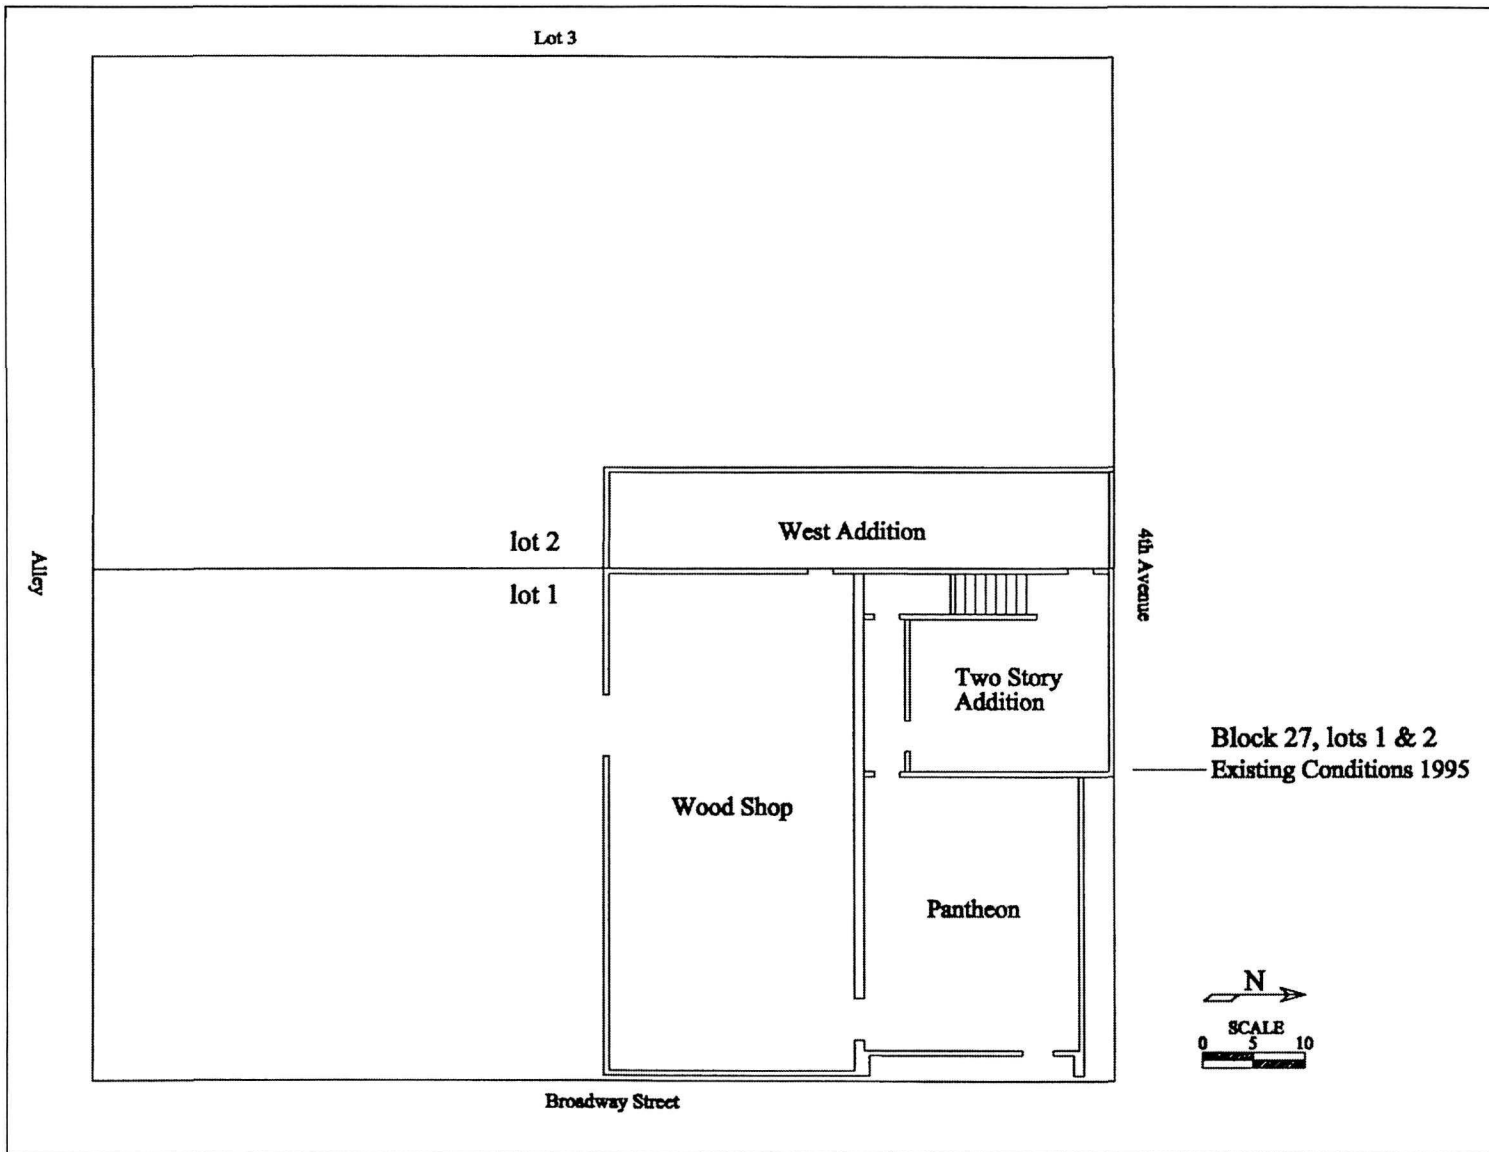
Existing 1995 Building Configuration (Drawn by T. Kardatzke)
